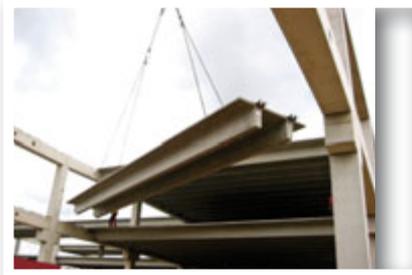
Composite secondary beams placed on girders by means of PBH Corbels
